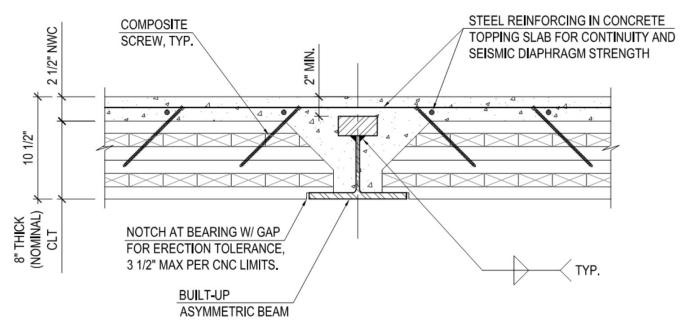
Typical composite timber deck and steel beam detail (Credit: AISC, 2017)
